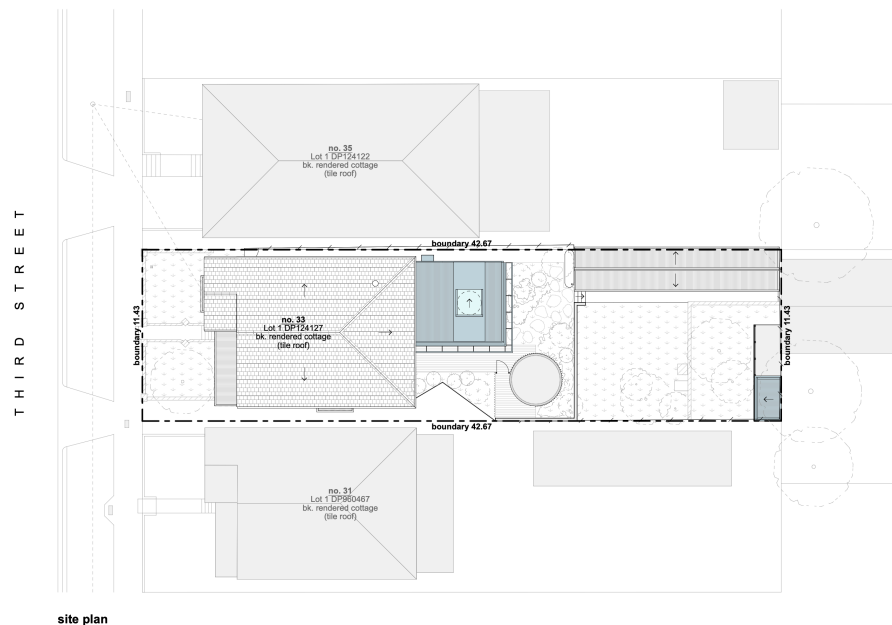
Location Plan of Subject Site – 33 Third Street, Ashbury NSW 2193
